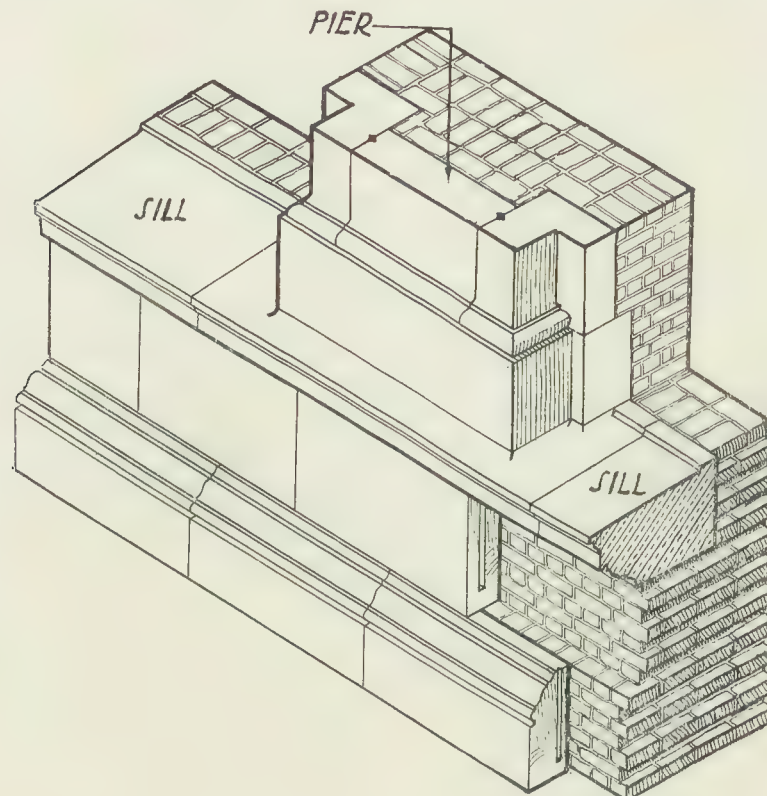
COMPOSITE STONE-FACED WALL WITH BRICK BACKING
